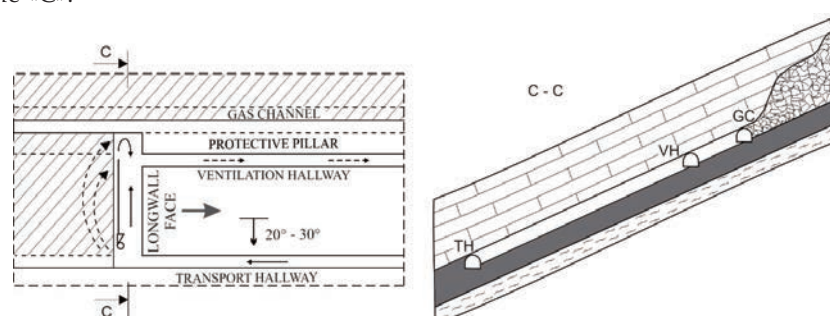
Longwall mining of the roof plate using separate ventilation for the upper part of the longwall face
